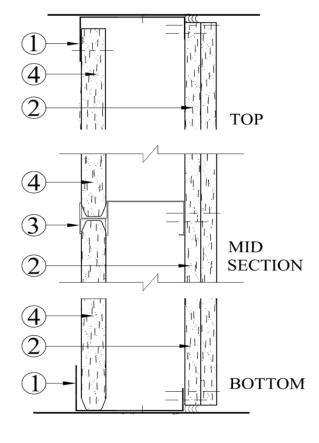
Two Hour Horizontal Stud Shaft Wall Assembly (Non-Load Bearing)
